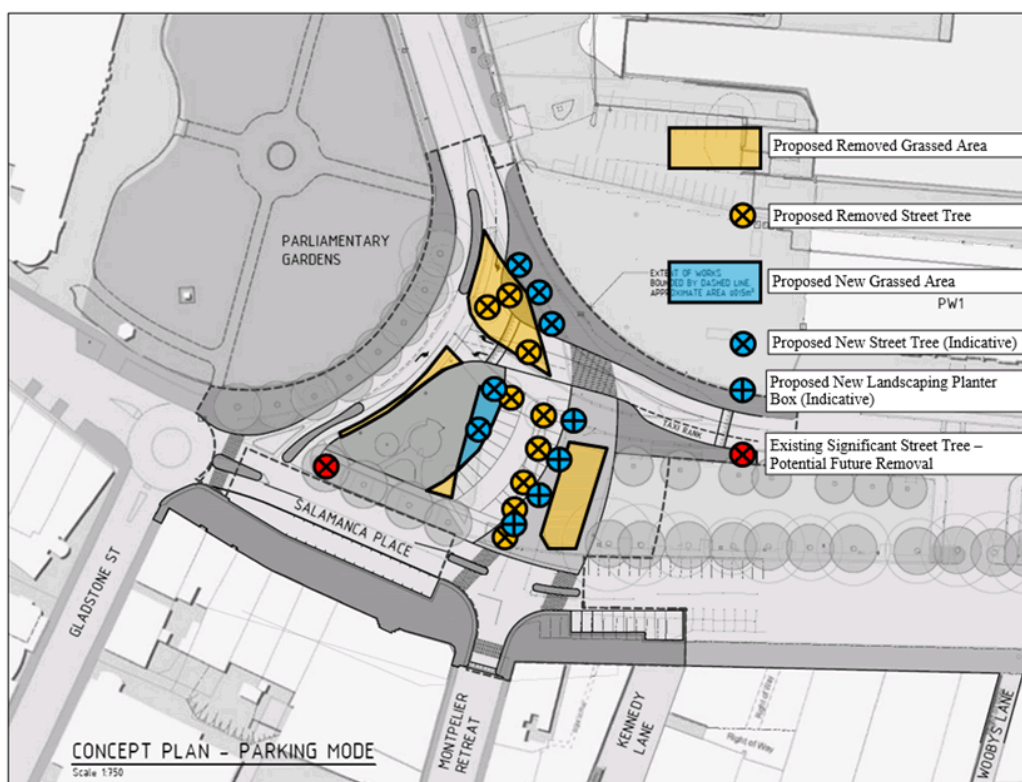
Proposed Alterations to Grassed Areas and Street Trees
